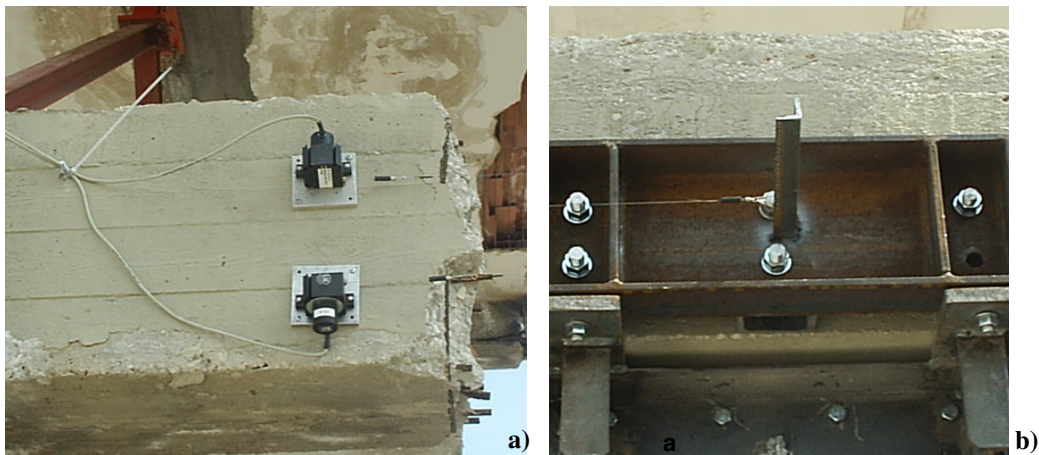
Transducers n.3 and 4 placed on the RC beam (a) and transducer n.4 applied on the steel beam (b)
